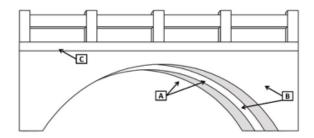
Concrete closed spandrel arch bridge A – arch rib, B – spandrel wall, C – deck, (Miller, et al., 2000)
